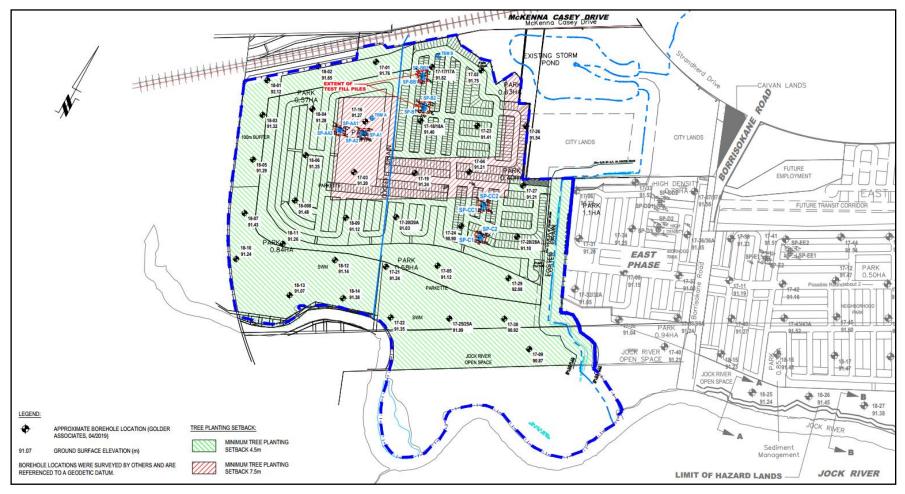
Soil sensitivity zones affecting tree planting restrictions
